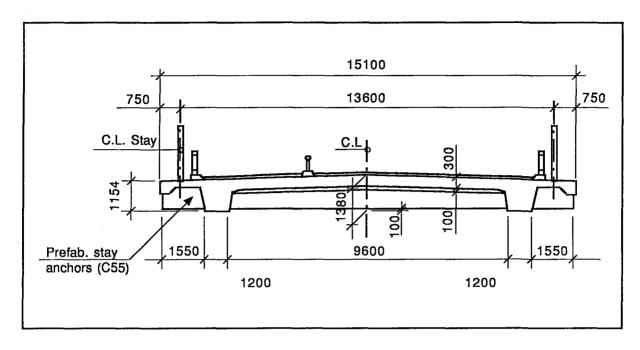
MAIN SPAN BRIDGE BEAM (In mm)
